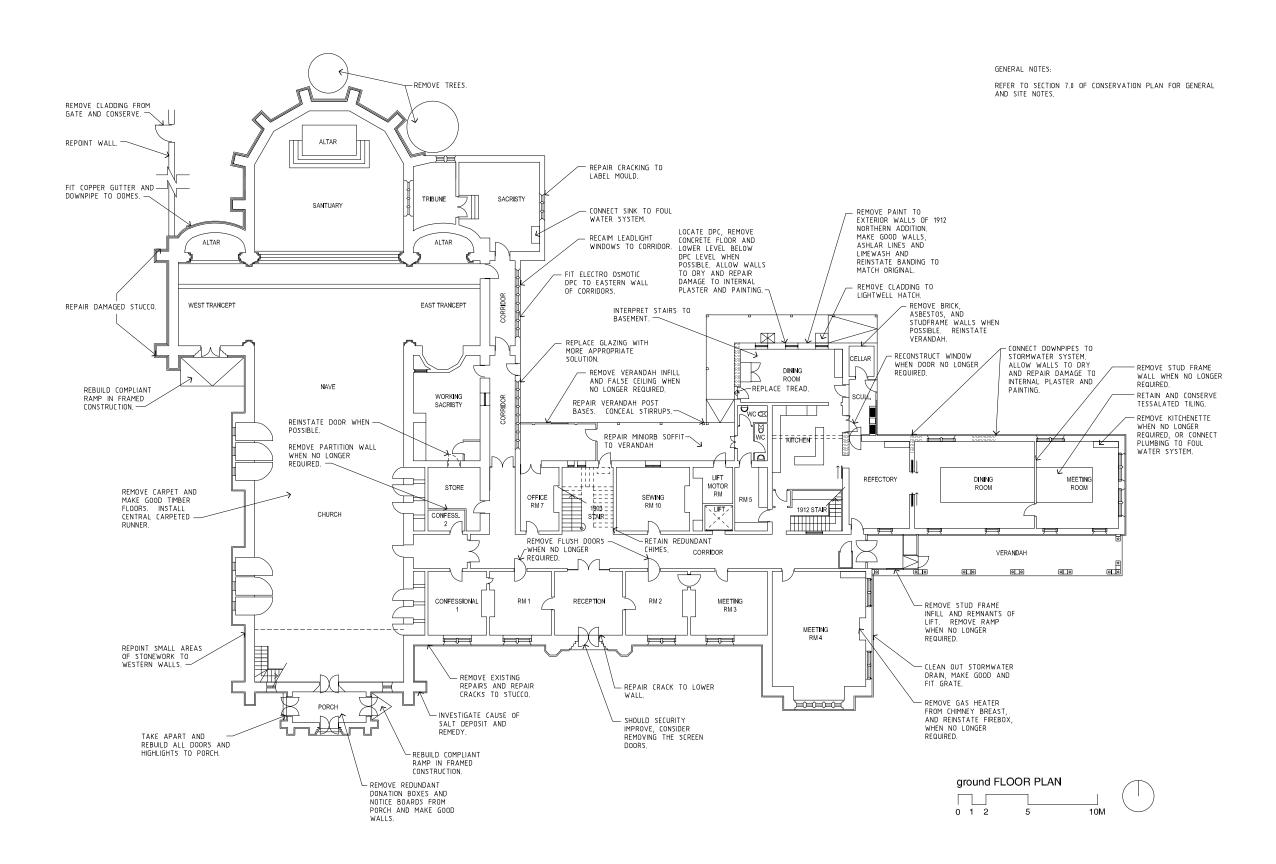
Recommended conservation works, ground floor plan. Plan is for diagrammatic purposes only. *Philip Griffiths Architects August 2010.
